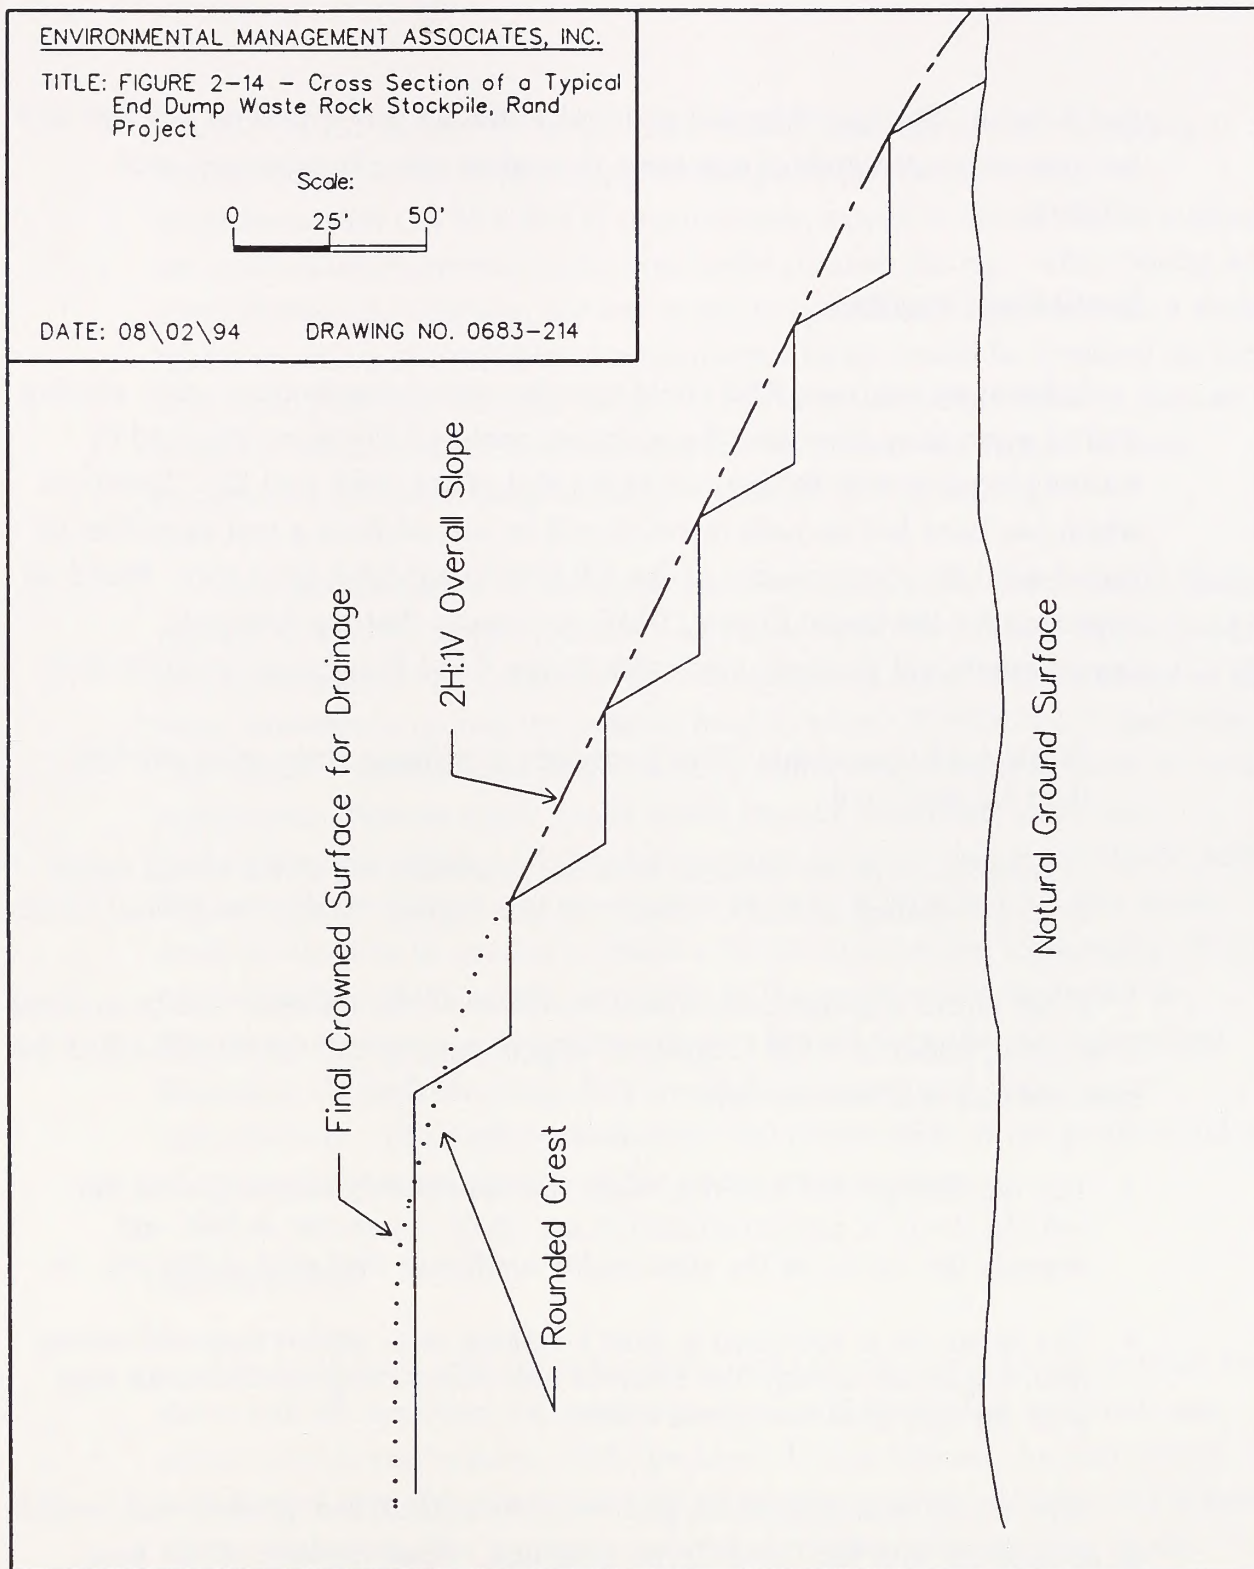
Cross Section of a Typical End-Dump Waste Rock Stockpile, Rand Project
